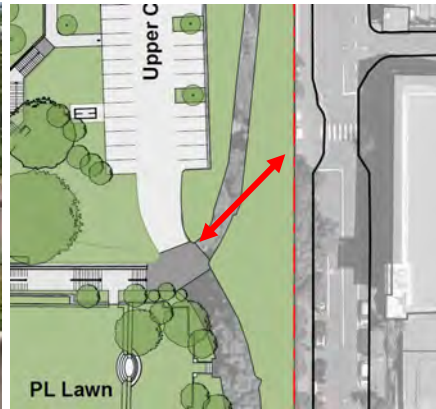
Recommended new stairs towards Hill Street (source: Studio Pacific)
